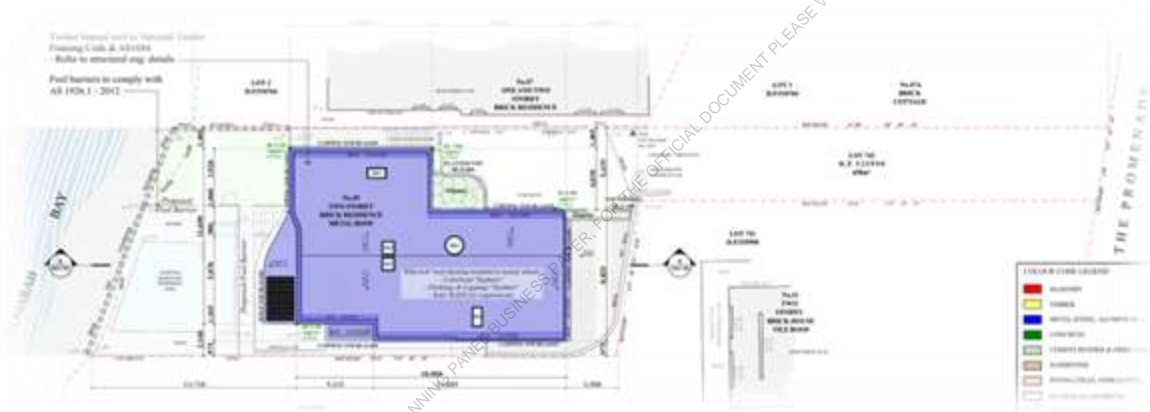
(Source: Amended Architectural plans, Graphio AM, dated 20 January 2025)
